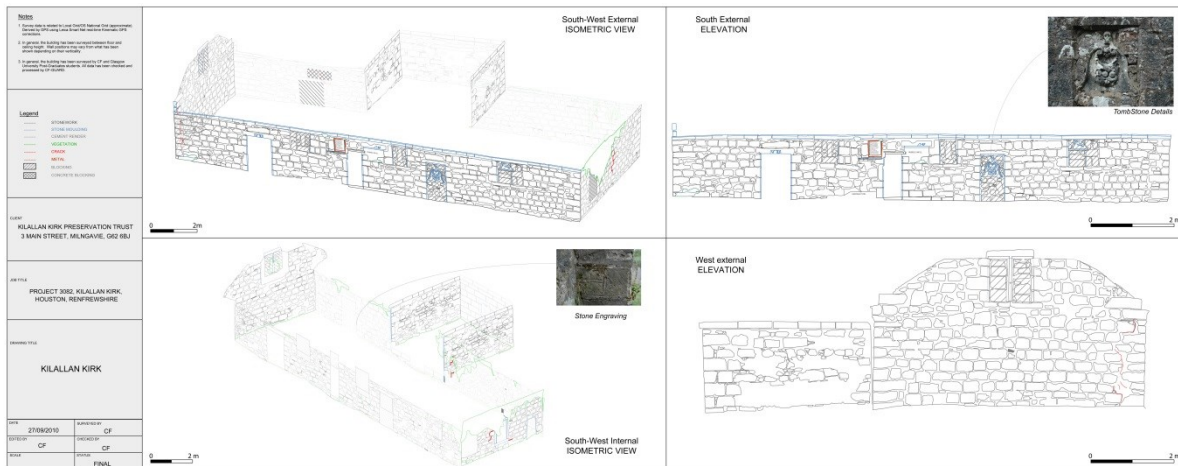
Detailed Scaled drawings from traditional standing building survey at Kilallan Kirk, Renfrewshire in 2010
